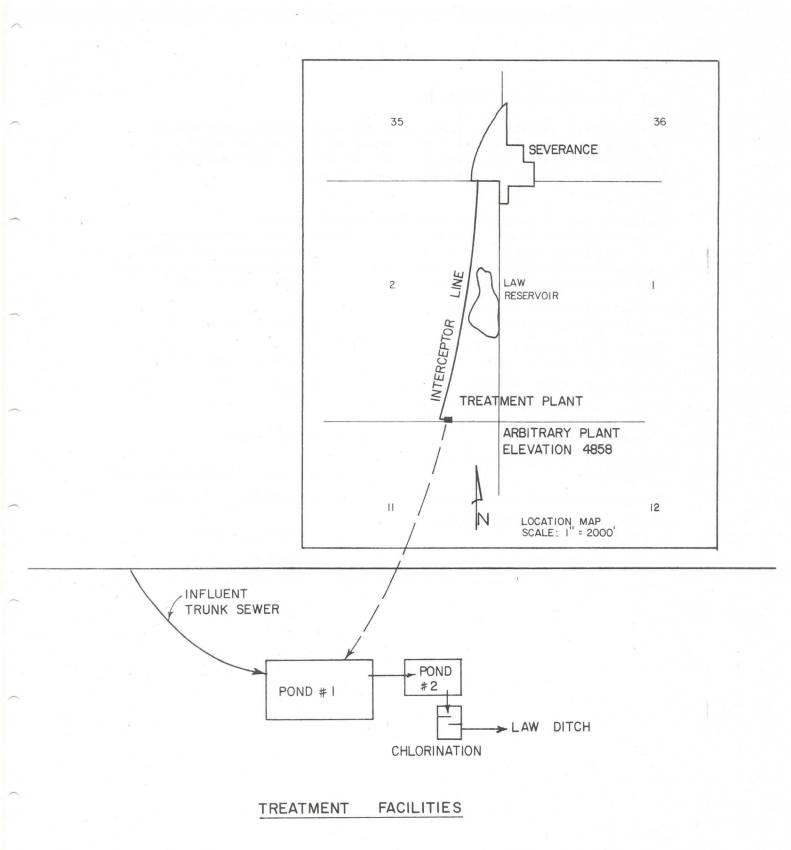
A. LOCATION OF PROPOSED FACILITIES SEVERANCE TECH PLAN
